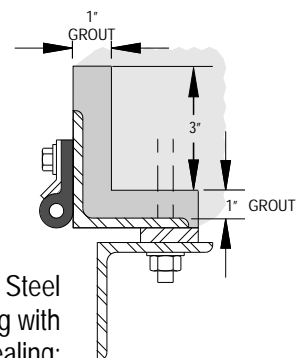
763- Stainless Steel End-of-Channel Mounting with J-Seals, for Tight Sealing; Section AA
